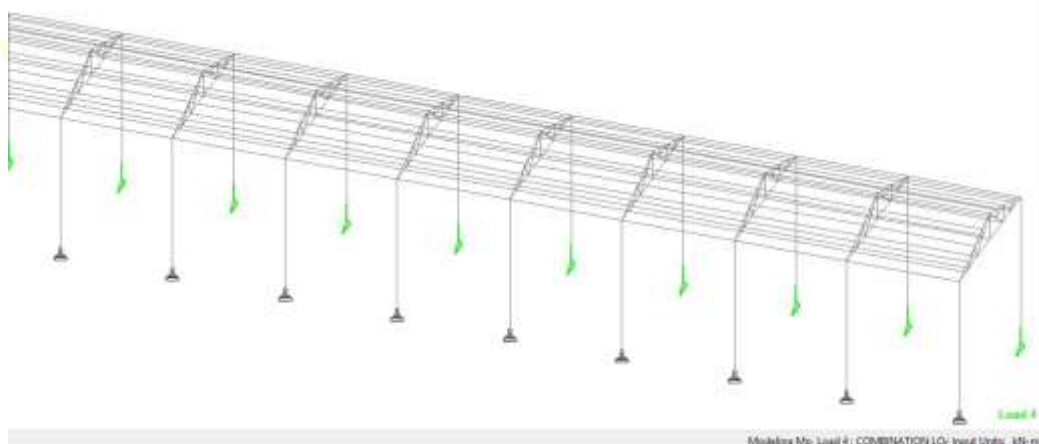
Conventional Steel Truss (CST) Industrial Shed with 9 Bays (8m Each, 12m Span)
